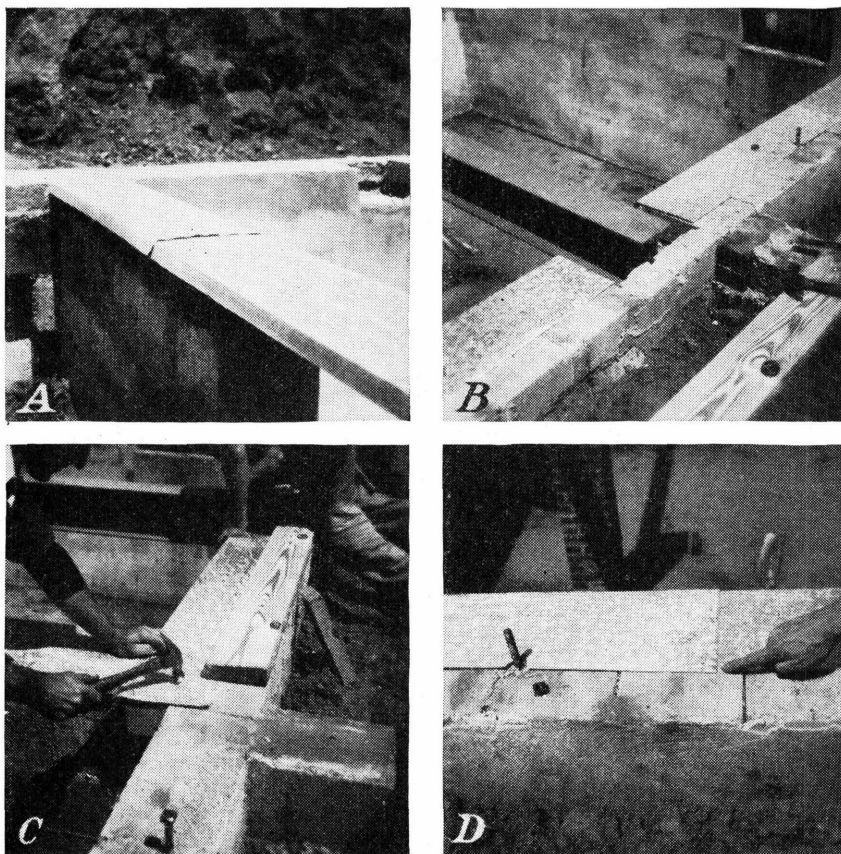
Improper methods of shielding. *A*, Bread-pan or through shield with penetrable lapped, unsoldered joint; *B*, uncapped strip shield on top of wall, also unprotected steel I-beam; *C* and *D*, shield nailed to concrete, metal joints penetrable, sill unprotected from hidden attack through unfilled joints in masonry.
